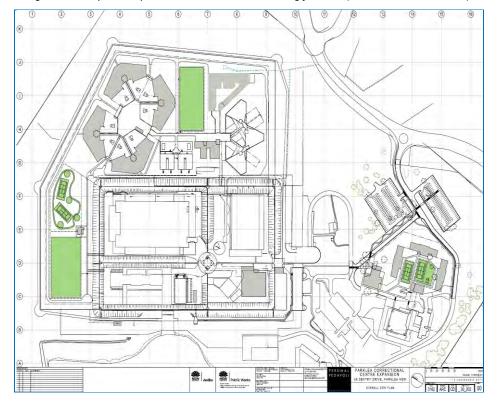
Proposed expansion and additions to existing facilities (NSW Public Works 2015)
